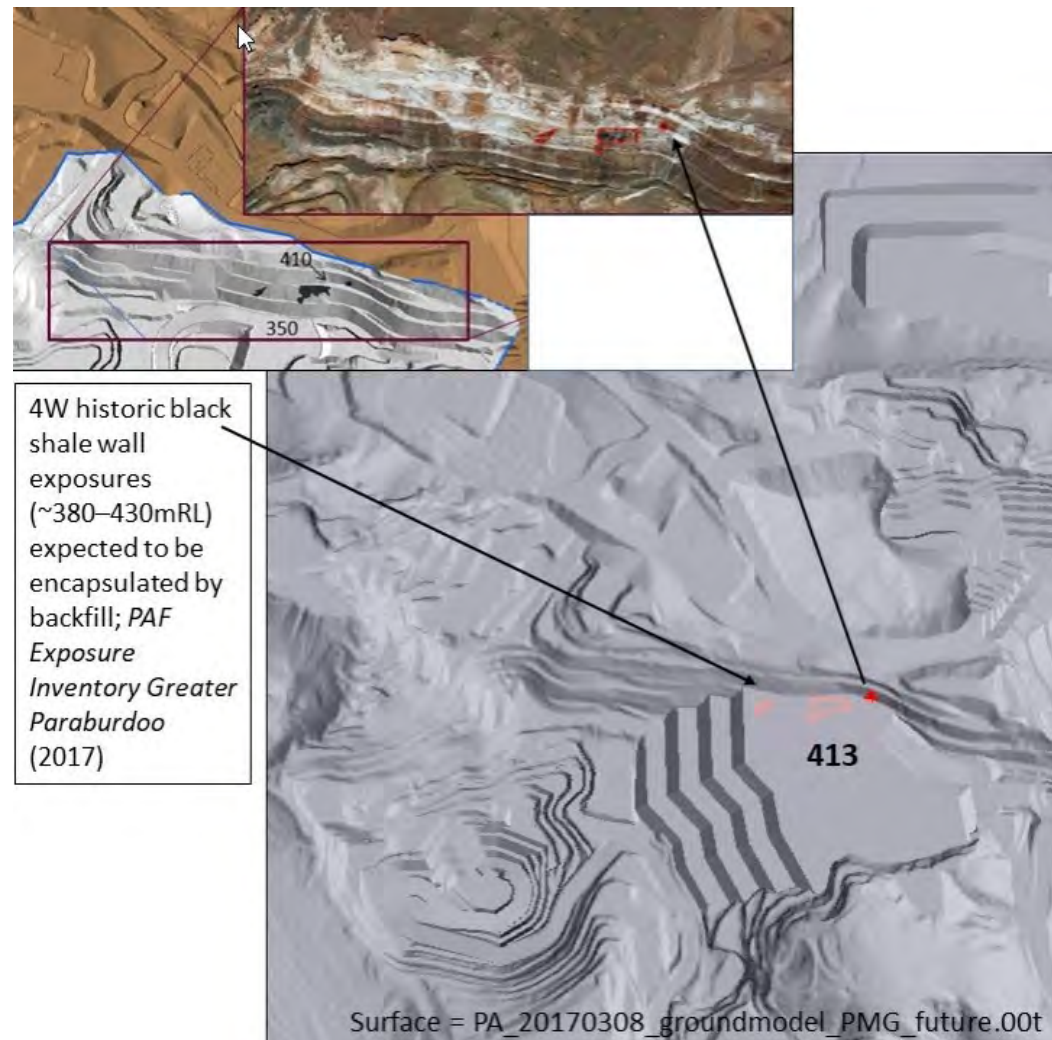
4 West pit showing exposures of black shale on the final pit shell.¹²
